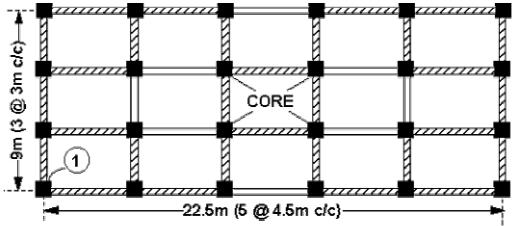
Plan at a typical storey of the example building considered in the study.
